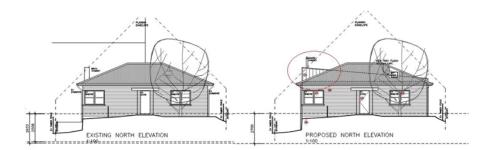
North (front) elevation (Steven Spizick Architect, 2021)
